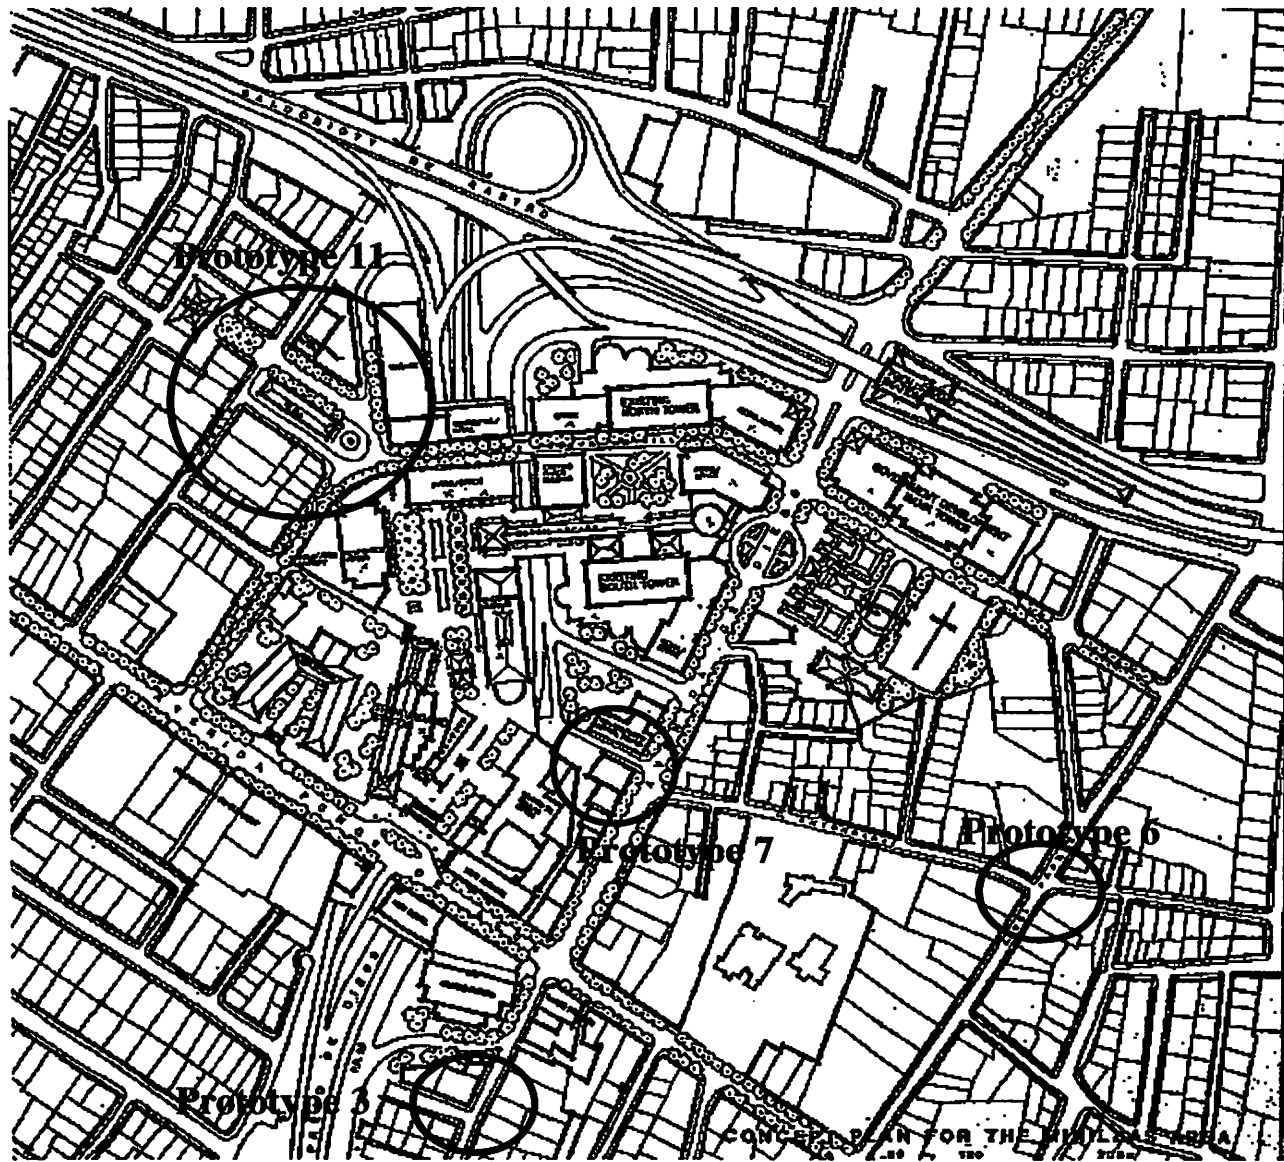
Plan of Minillas Tren Urbano Stop by D'Agostino Izzo Quirk. Plan courtesy of architects
